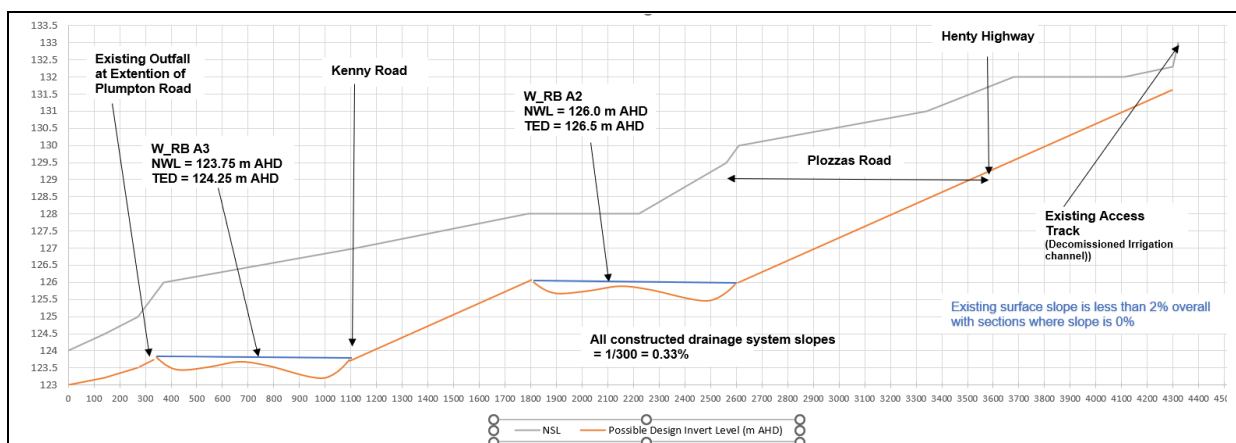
Possible Longitudinal Section of a “Trunk” drainage system in Catchment A along the alignment detailed in Figure A.1 (Appendix A).
